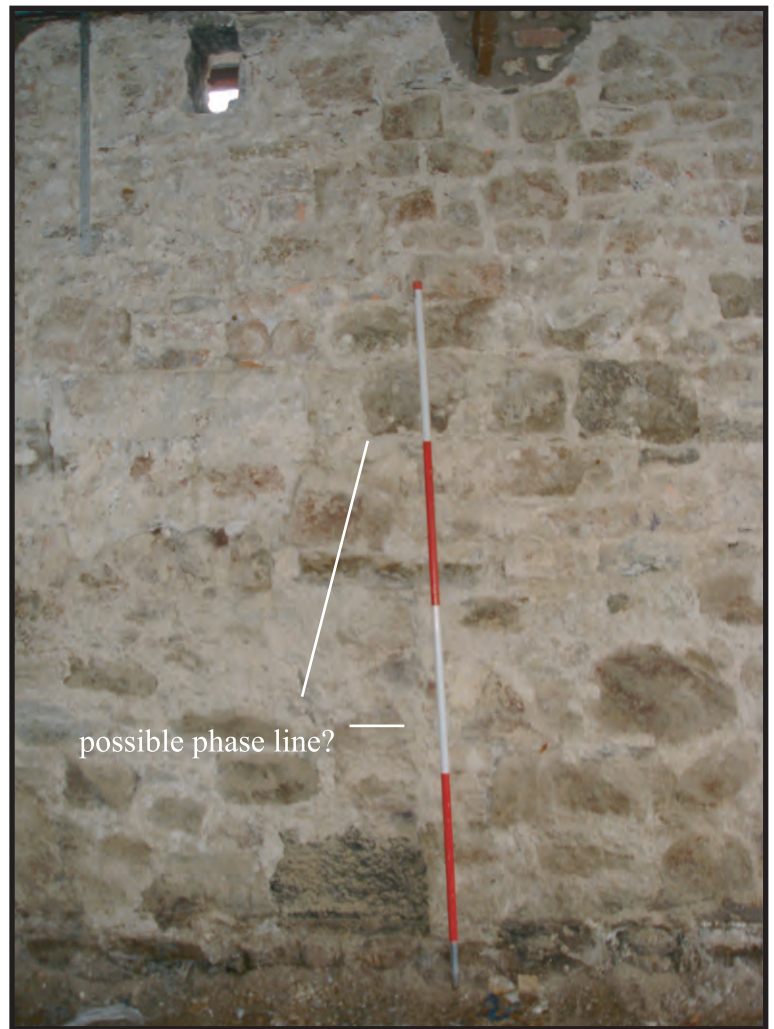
Building B, Area B1, detail of the south-west wall showing the broken away stone partition wall (F62) (to the left)
